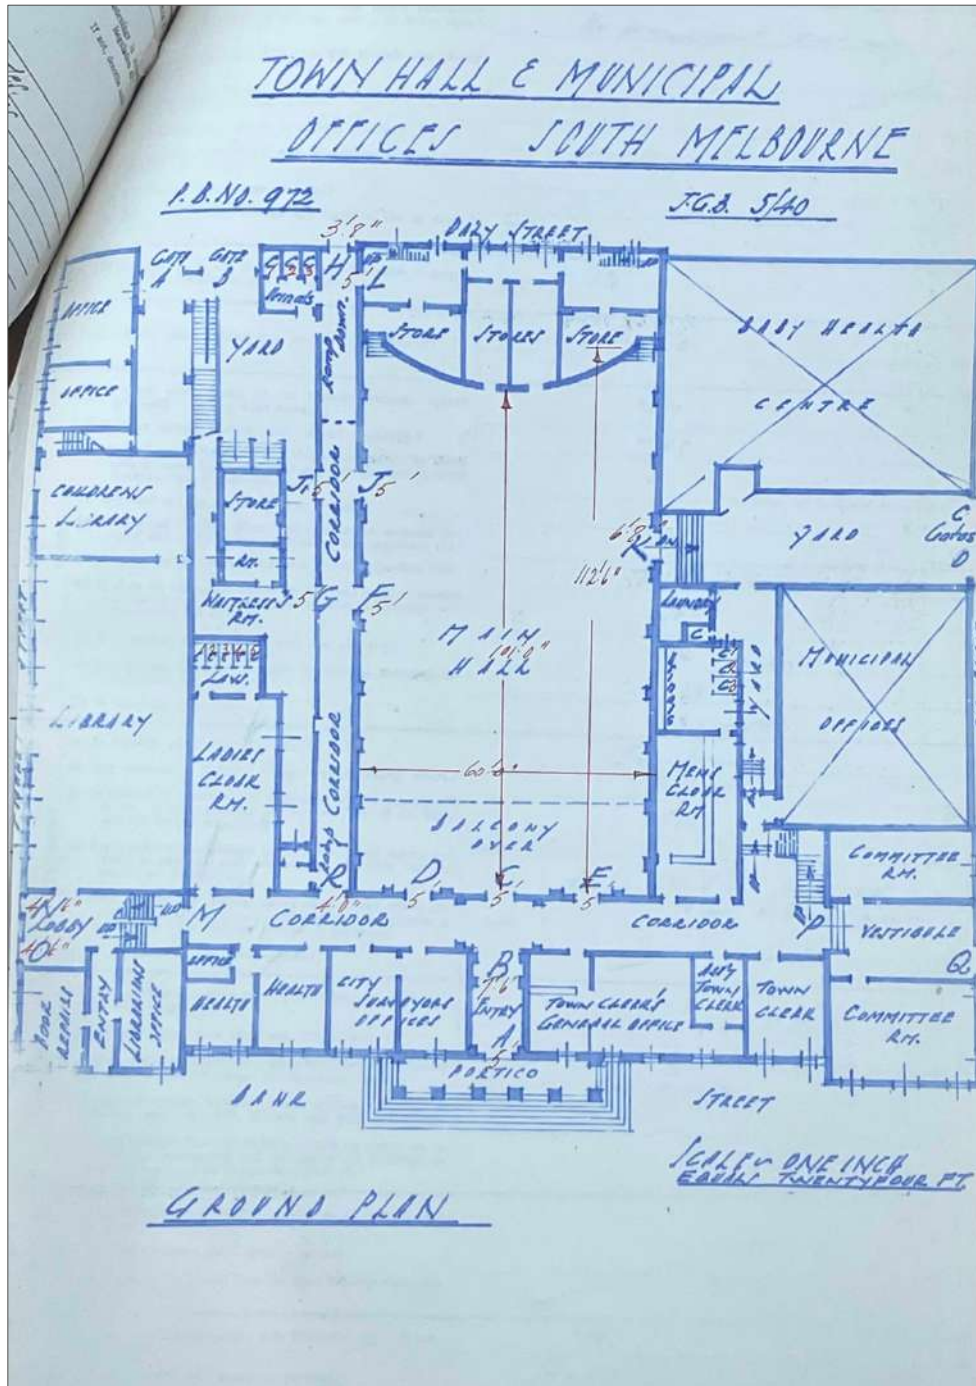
South Melbourne Town Hall ground floor plan, 1940. Source: Public Record Office Victoria.
